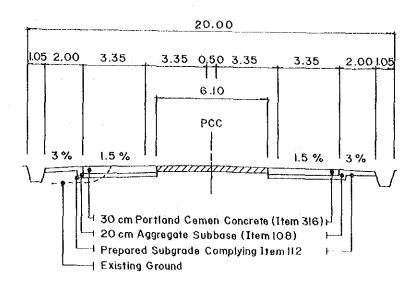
PROPOSED WIDENING TO FOUR LANES CALAMBA – STO. TOMAS SECTION SCALE 1:200
